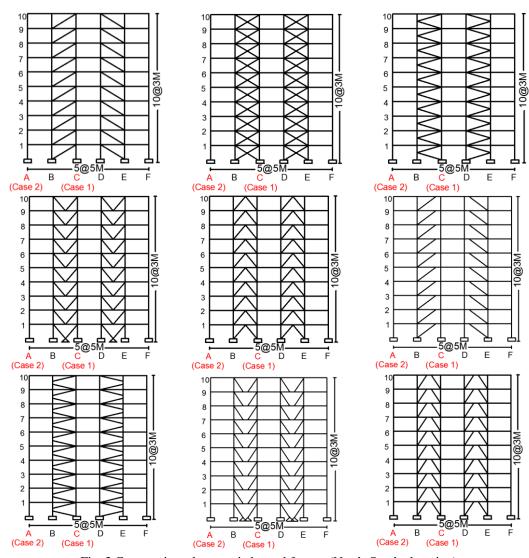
Concentric and eccentric braced frames (North-South elevation)
